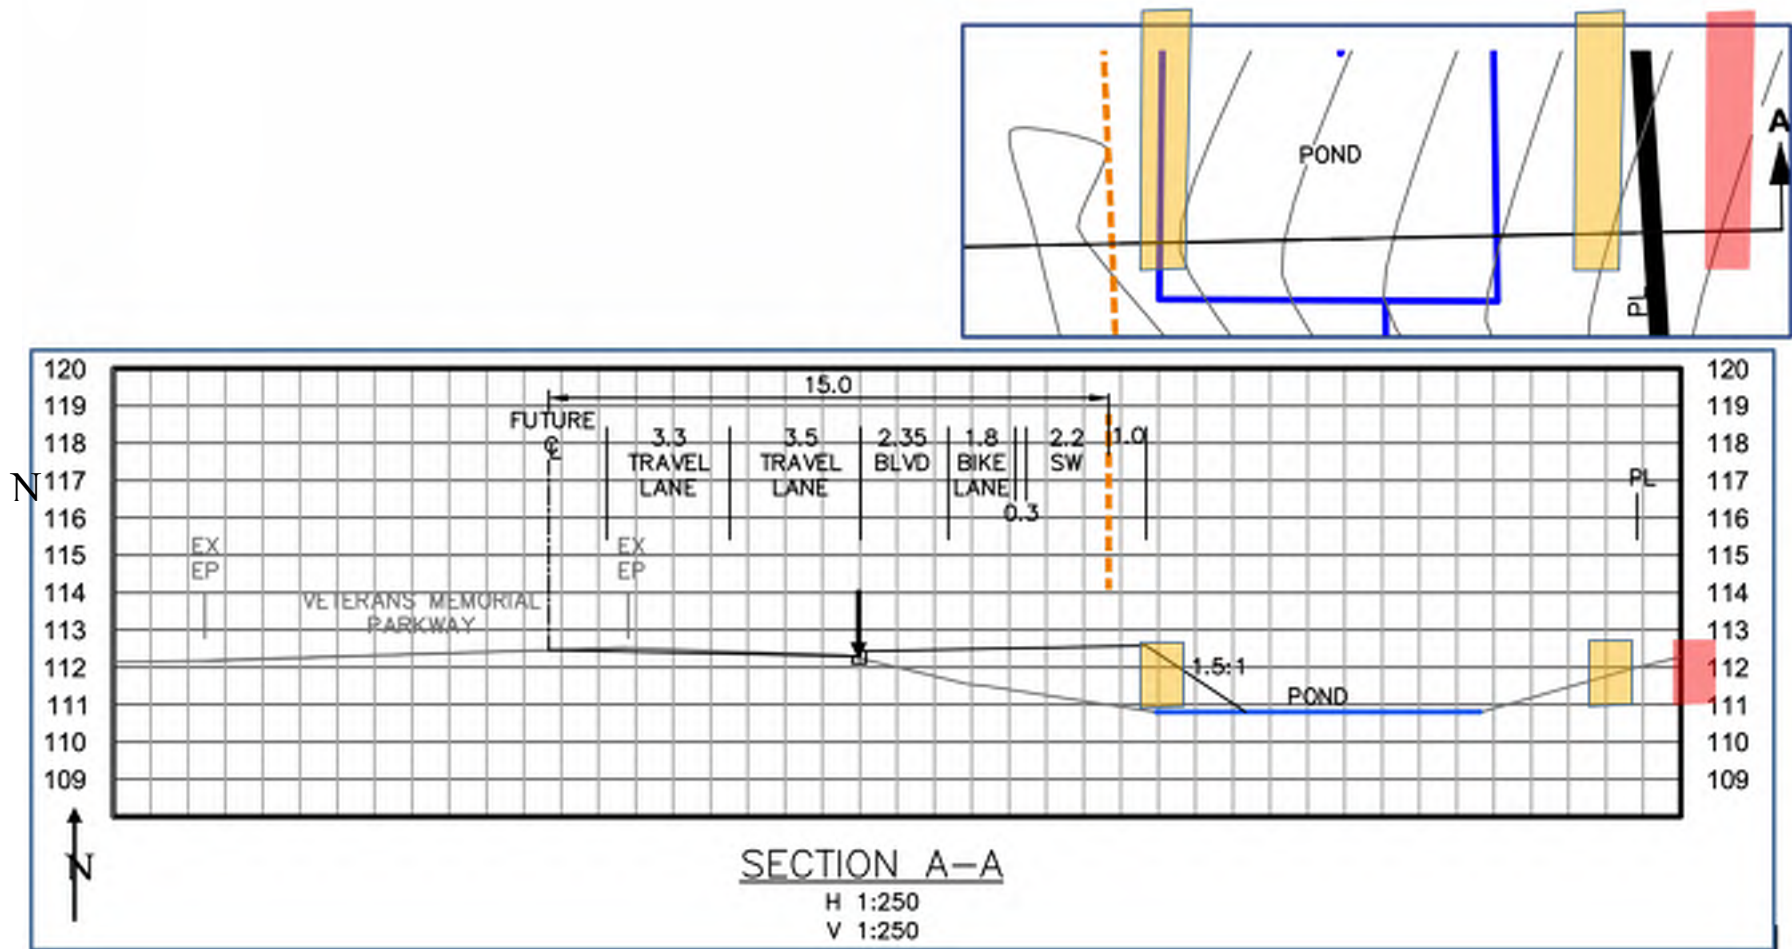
Coloured rectangles = Flex MSE retaining walls (1.0m wide X 2.0m Height). Current western sloping side wall of pond could be replaced with a vertical Flex MSE retaining wall, 7.5m west of existing SW Pond top-of-bank (black arrow); the eastern sloping side wall of pond could be replaced with a vertical Flex MSE, either within the VMP ROW (orange rectangle) or moved east on private land (red rectangle). If a “no-net-loss” of SW pond volume is required, the red Flex MSE vertical wall would be moved east to maintain the historical pond volume. Insert, upper right, shows the vertical Flex MSE retaining walls in Plan View.
